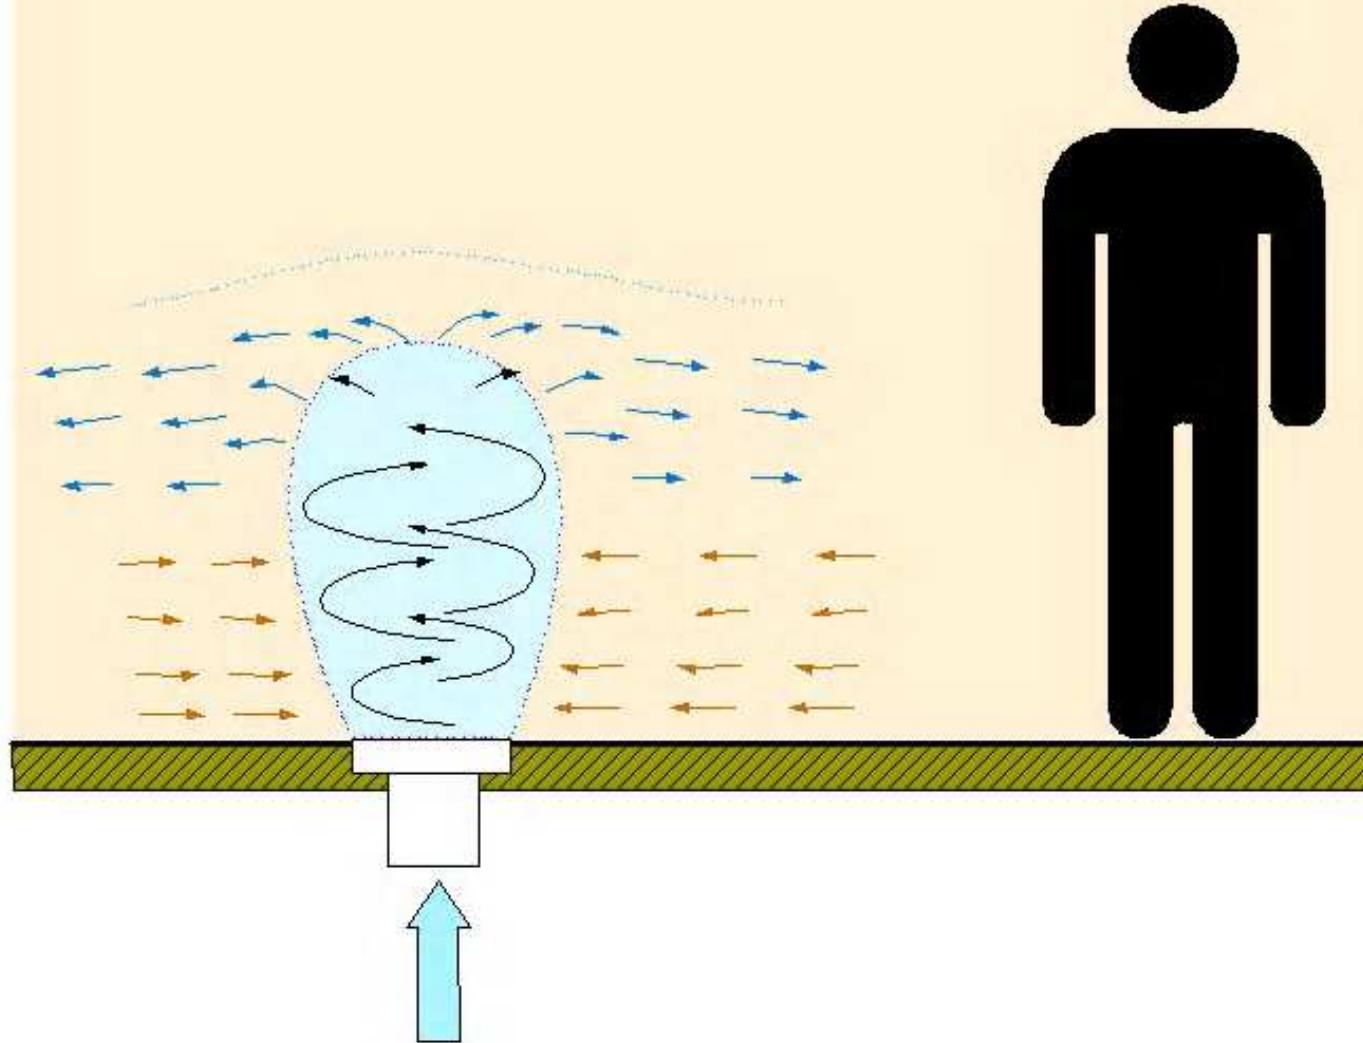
A floor-mounted diffuser should have the right vertical momentum.
